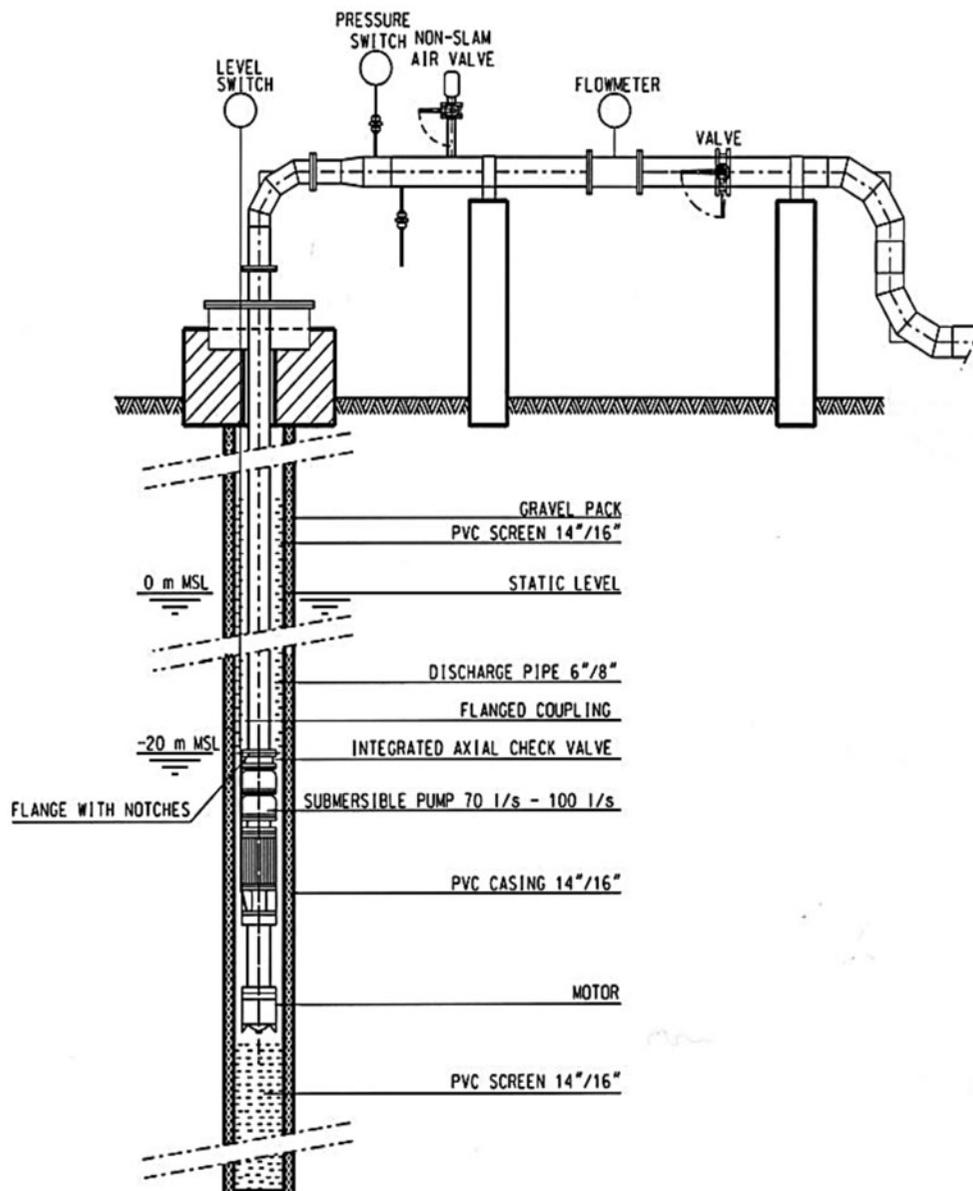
Typical beach well layout in Sur plant in Oman [33].
